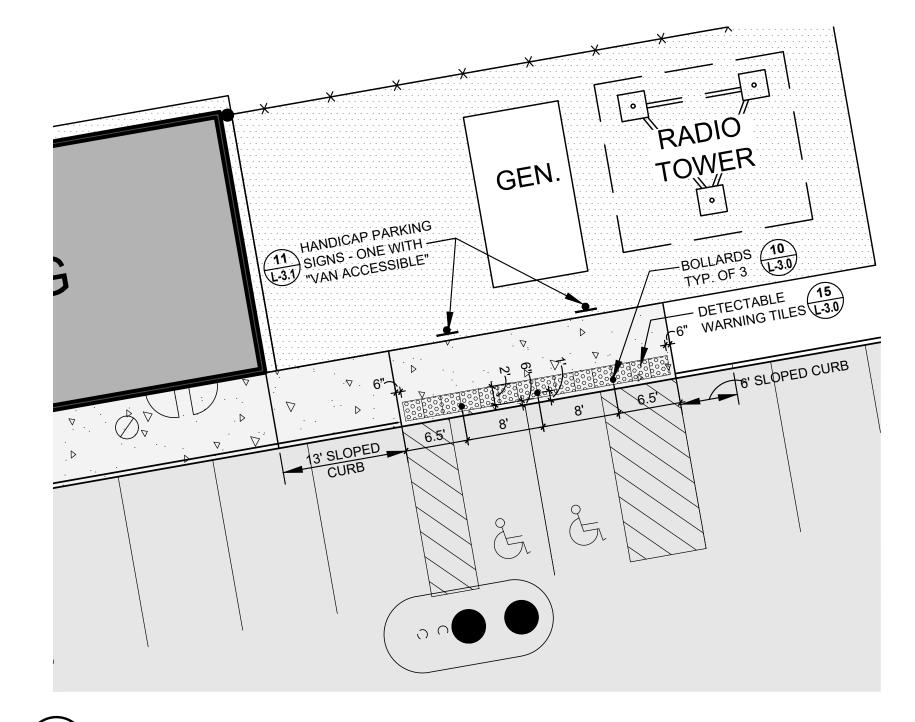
DETAILED LAYOUT - PUBLIC HC PARKING SPACES
